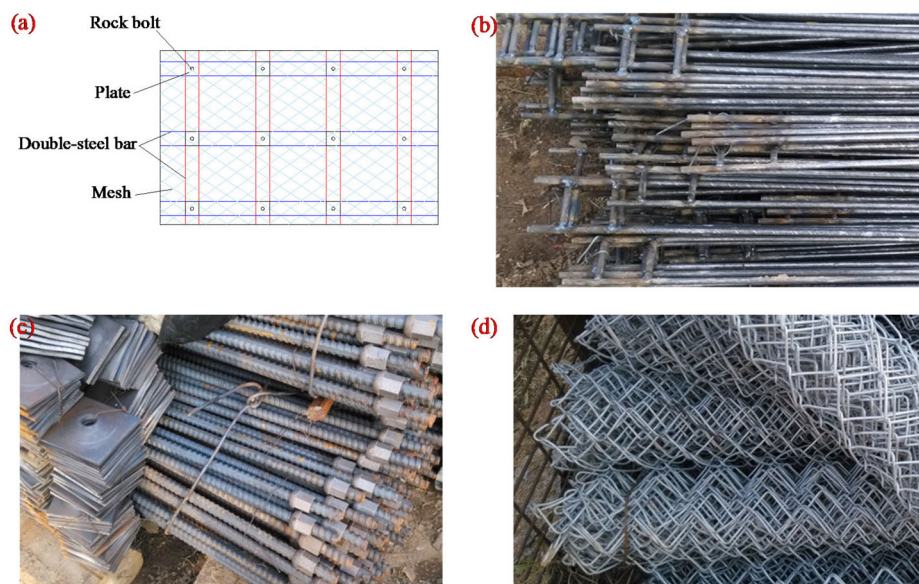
Layout of rock bolts, mesh, and double-steel bars.
